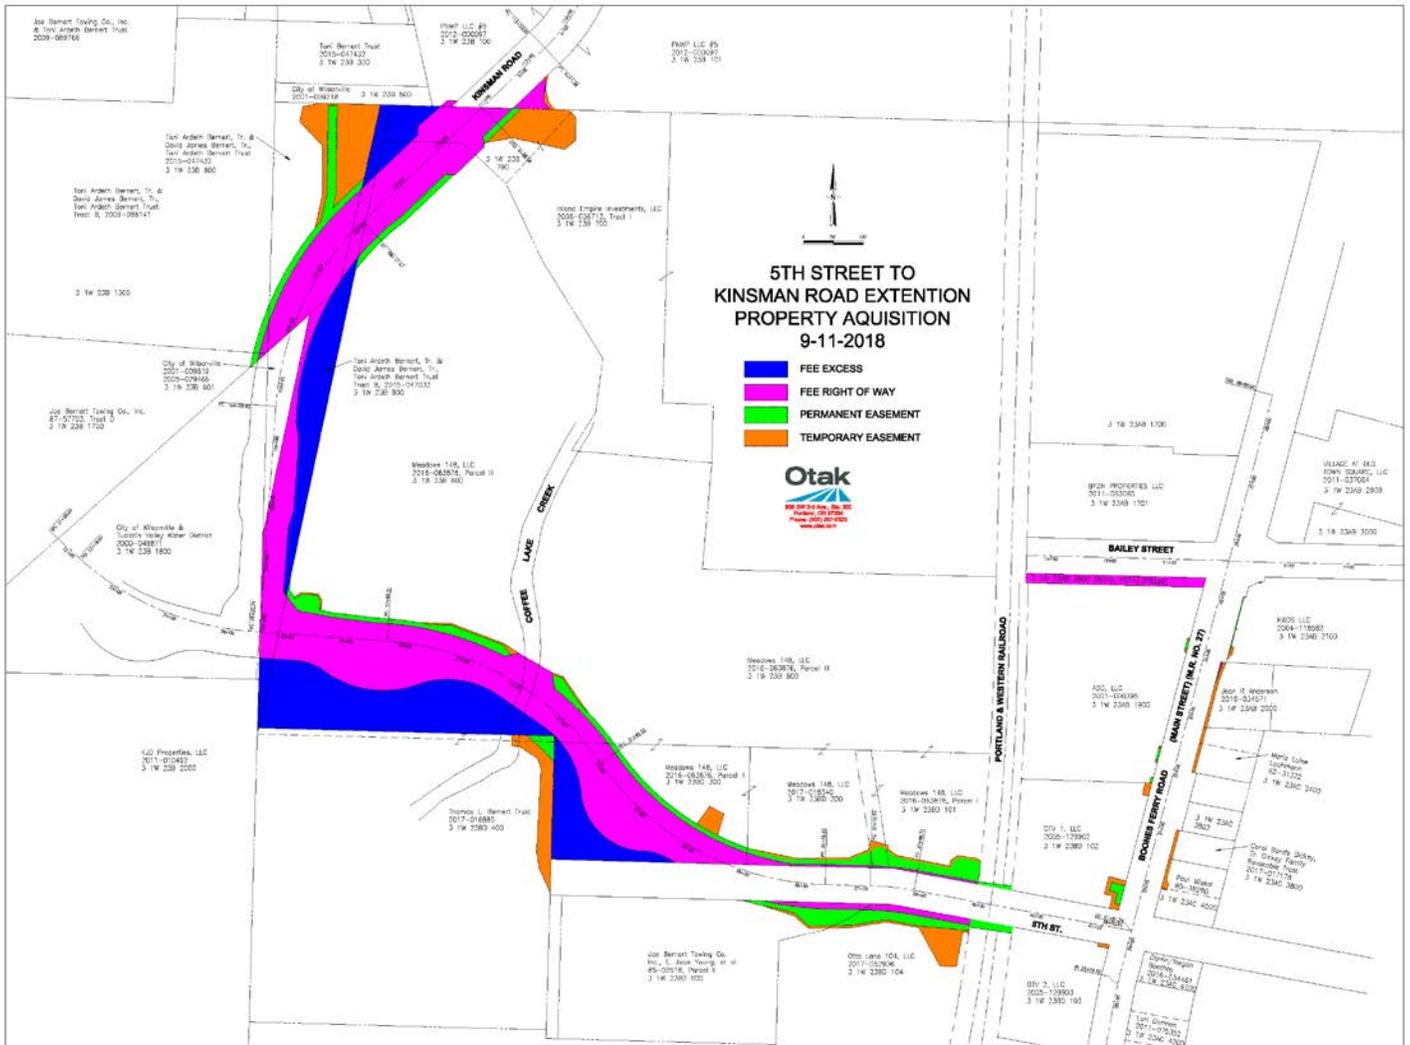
Year 2000 Urban Renewal Plan 12th Amendment
